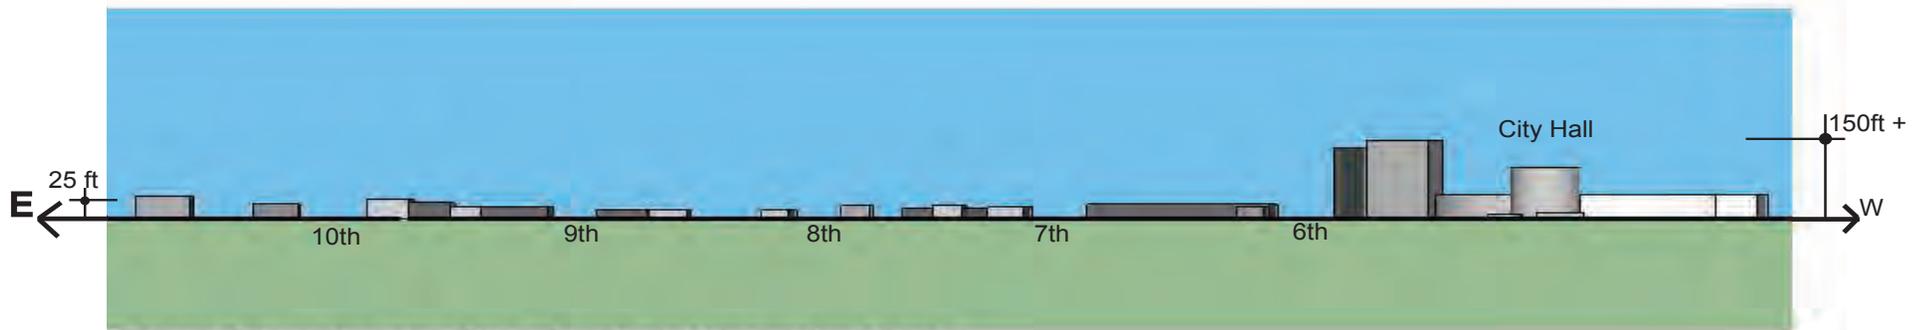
Street Elevations Looking North of East Santa Clara Street A-A1
